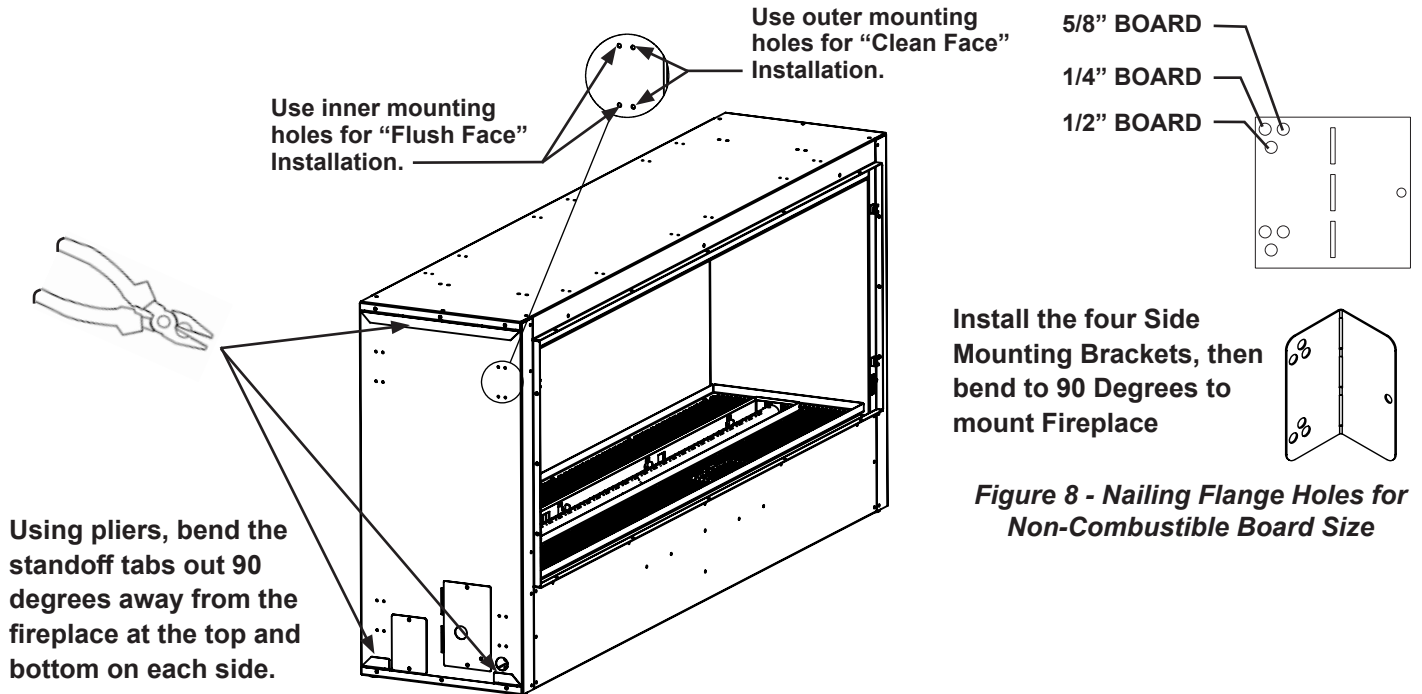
Mounting Holes for Flanges and Standoff Brackets
